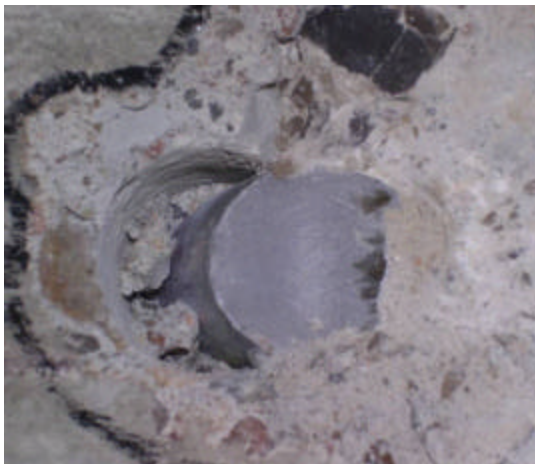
Shear failure of the Specimen HTFGB-ST below the steel-concrete interface
